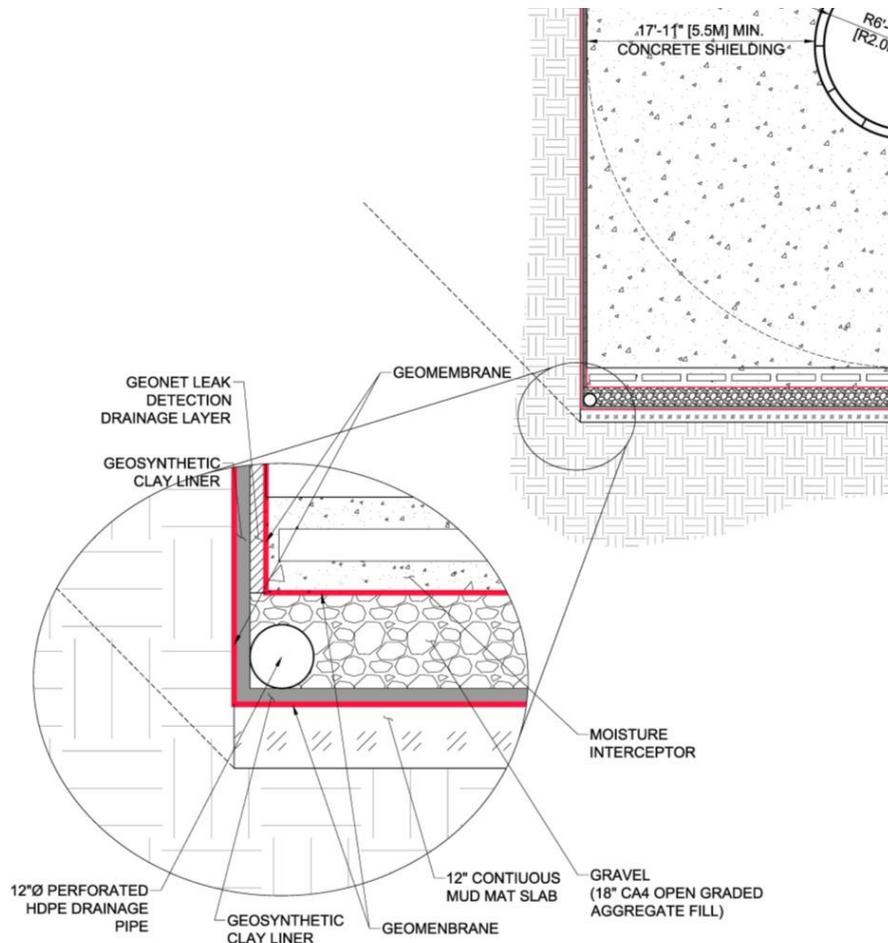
Decay Pipe cross section showing the base of the Decay Pipe barrier system.
